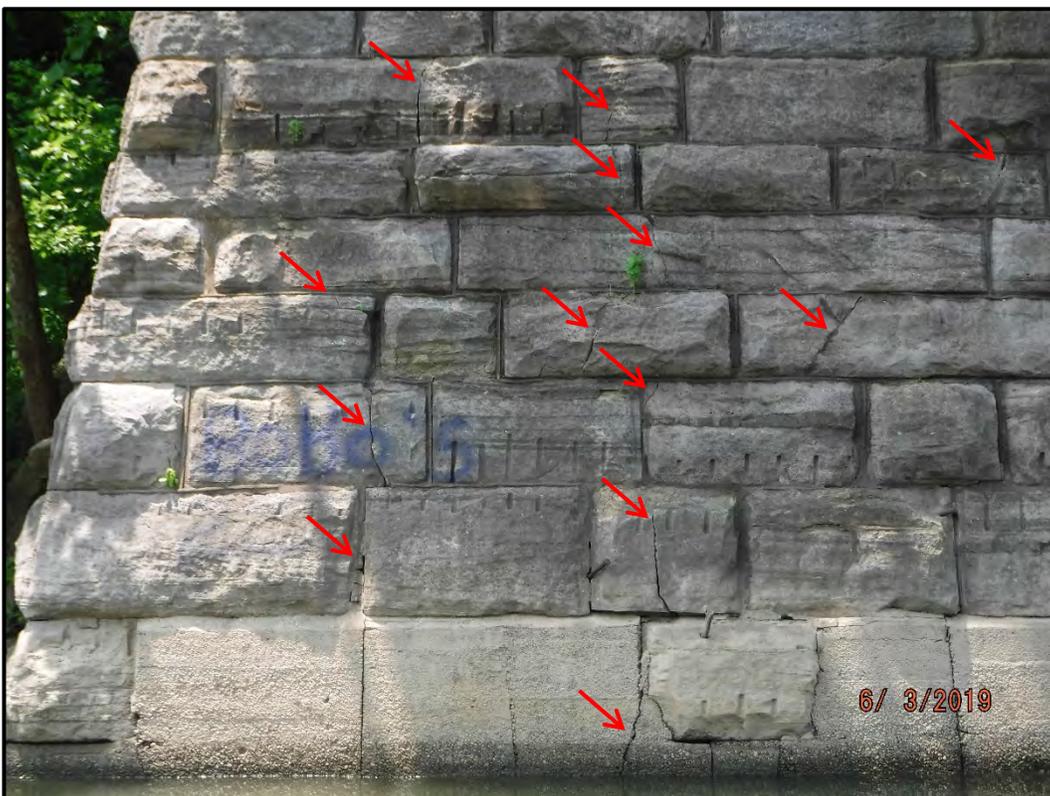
Minor cracking throughout the south end of the Pier 6 east face. Note the stones at the waterline are encased in concrete and have vertical cracks spaced at 2ft.
